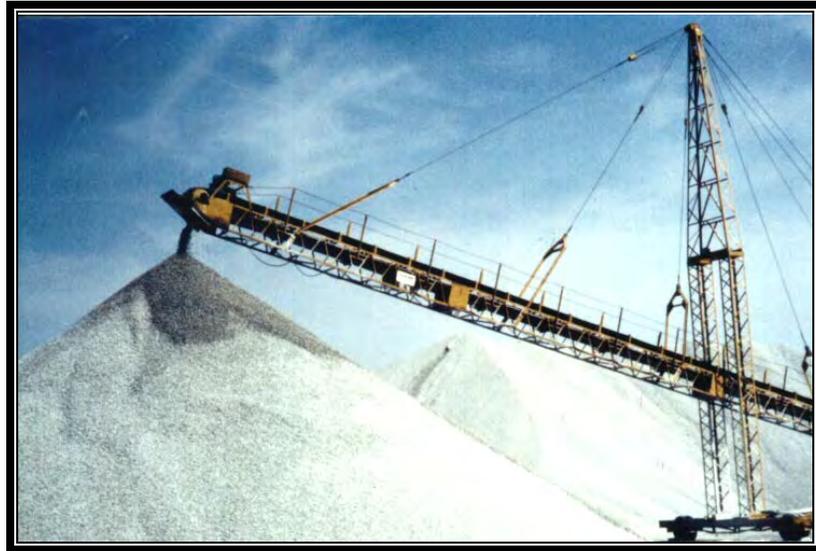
Adjustable Conveyor with Mixing Paddle
